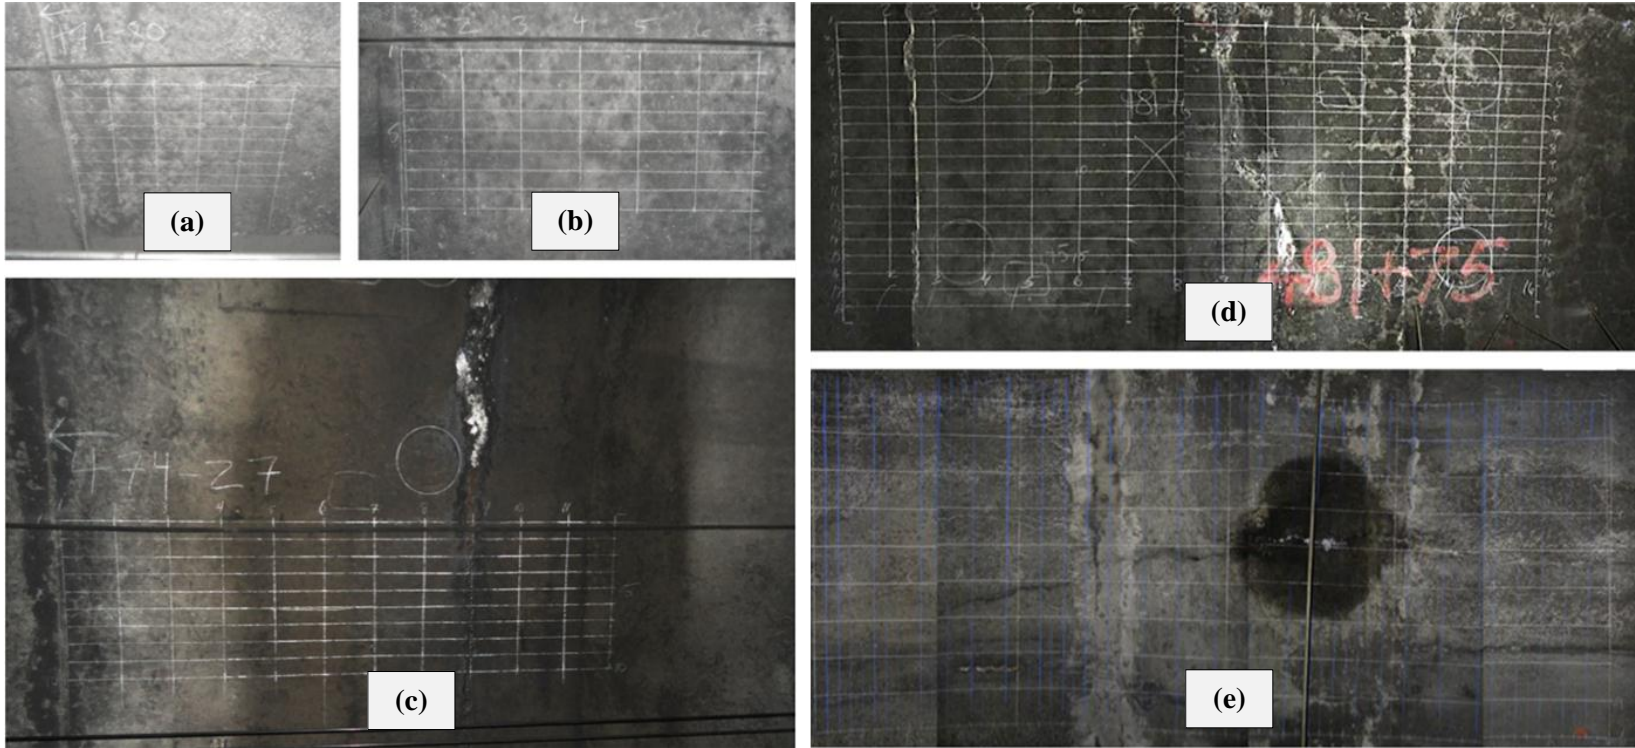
Areas tested at Chesapeake Bay Tunnel
